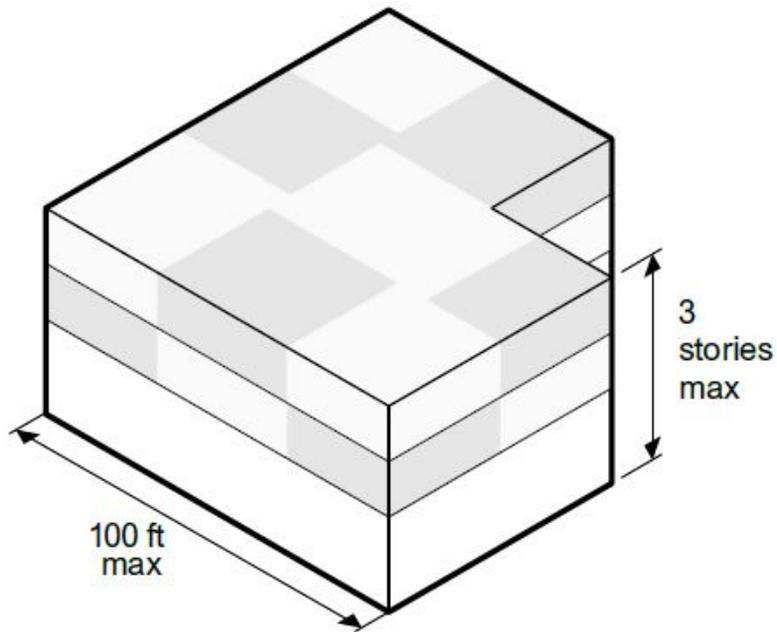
Maximum Width Requirements for Townhouse Sections and Small-Multi-Use Buildings
